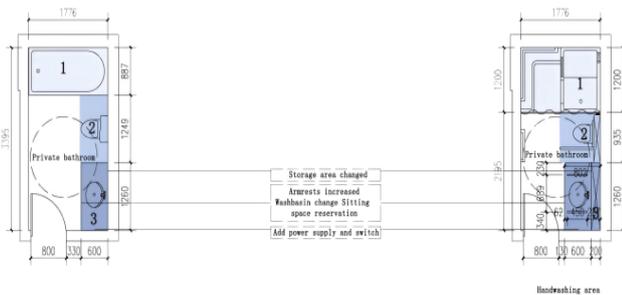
Modified Floor Plan of the Vanity Area in the Master En-Suite Bathroom (Source: Self-drawn)
